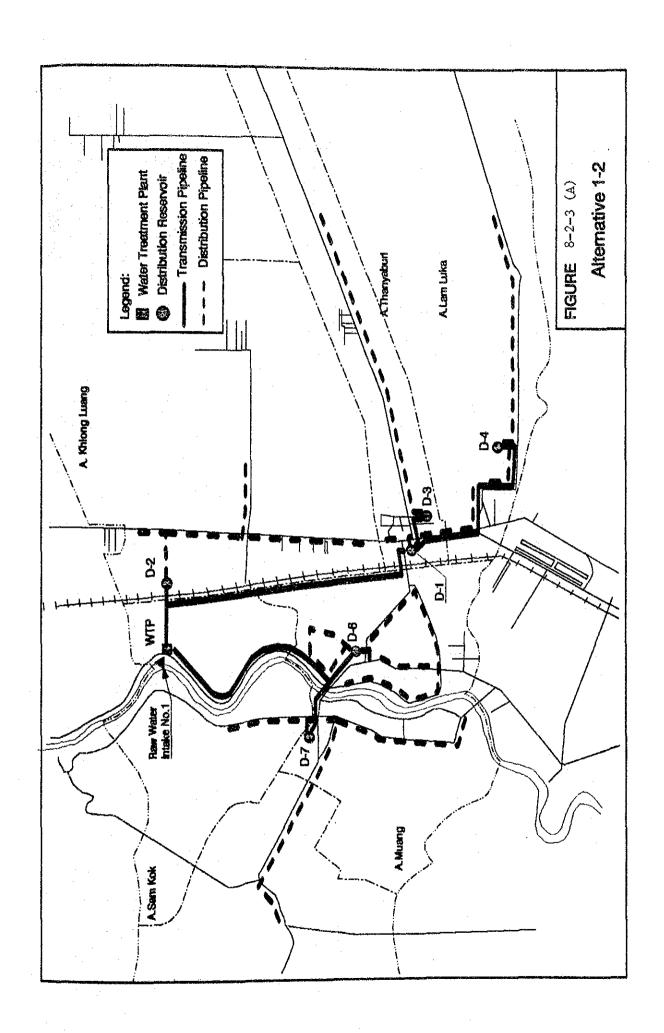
to 8-2-7 show schematic plans and system diagram for the six alternatives.
